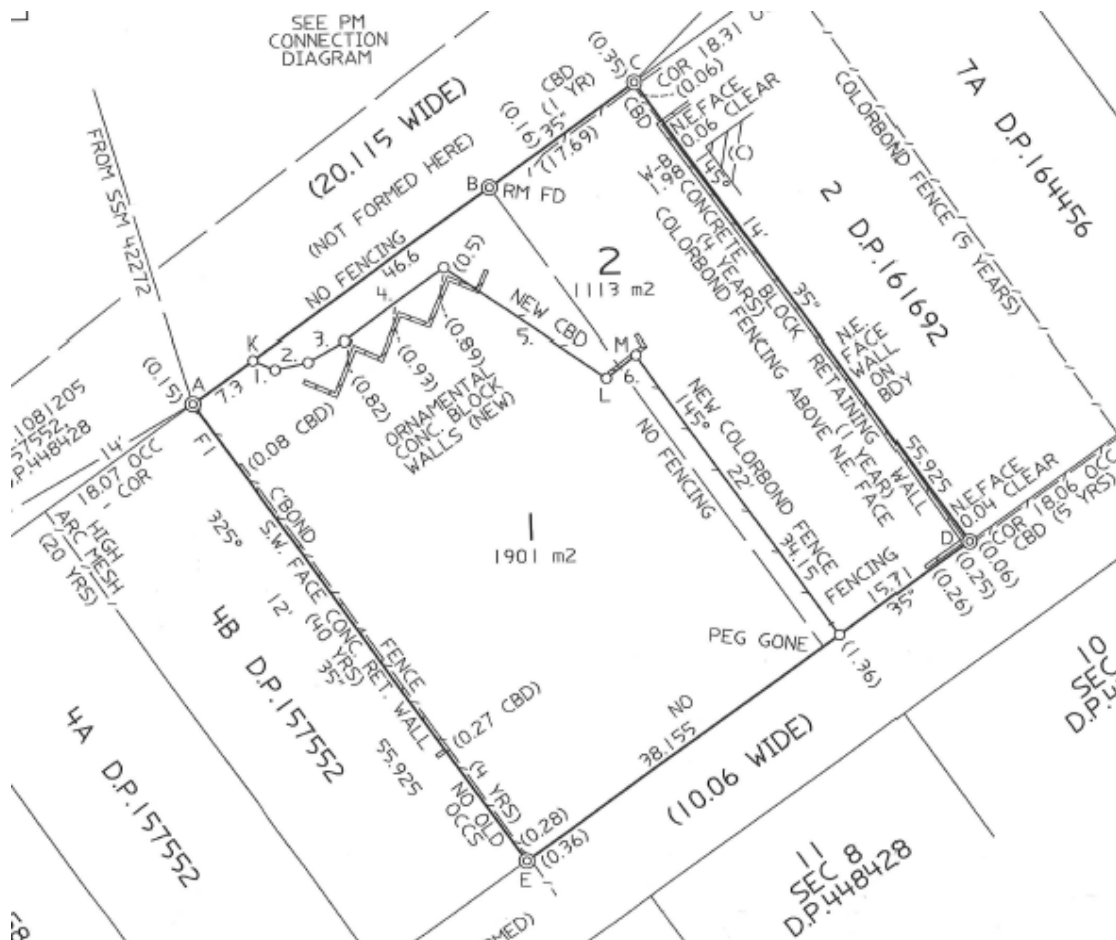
Survey Plan – Subdivision (Boundary Adjustment) under DA-70/2015
